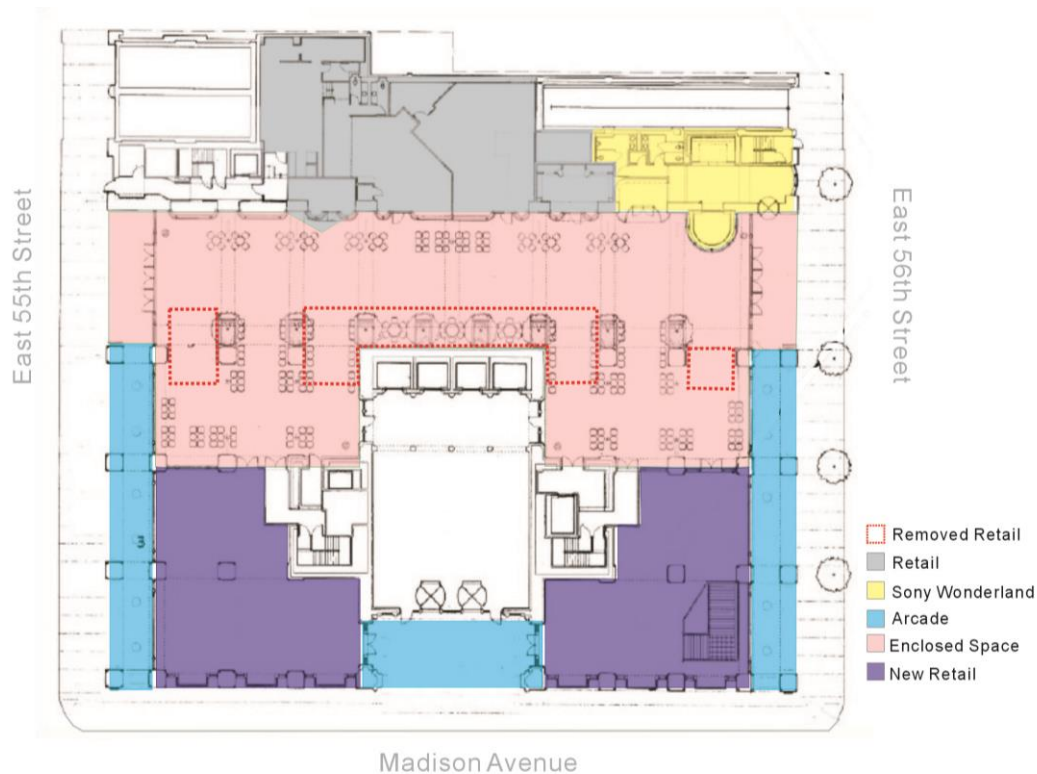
Ground Floor Plan after Sony USA's Redesign
